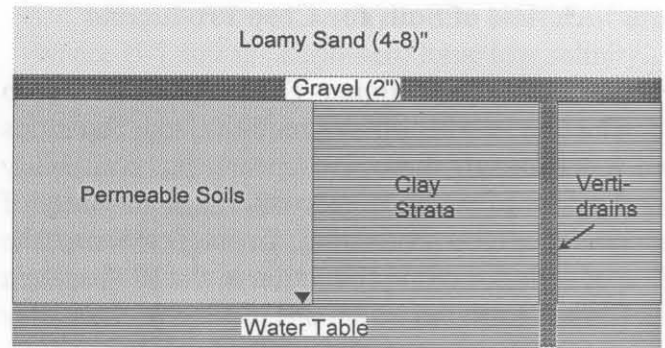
A cross-sectional view of ground preparation in high water table areas with permeable sub-soils or clay sub-soils with verti-drains.
